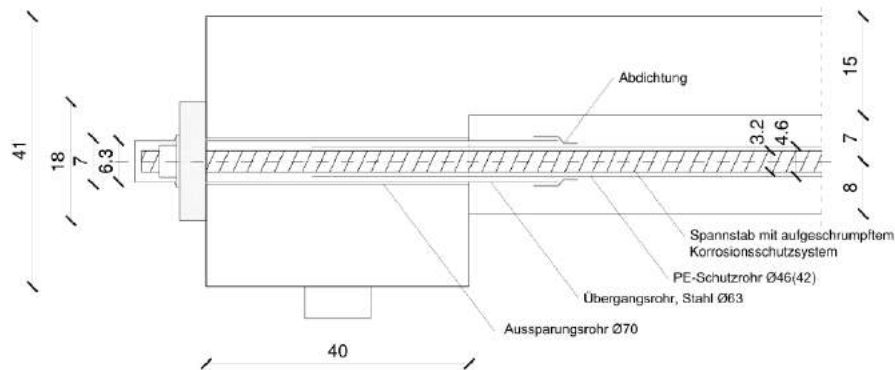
Anchorage of the steel bars (scale 1:5).
